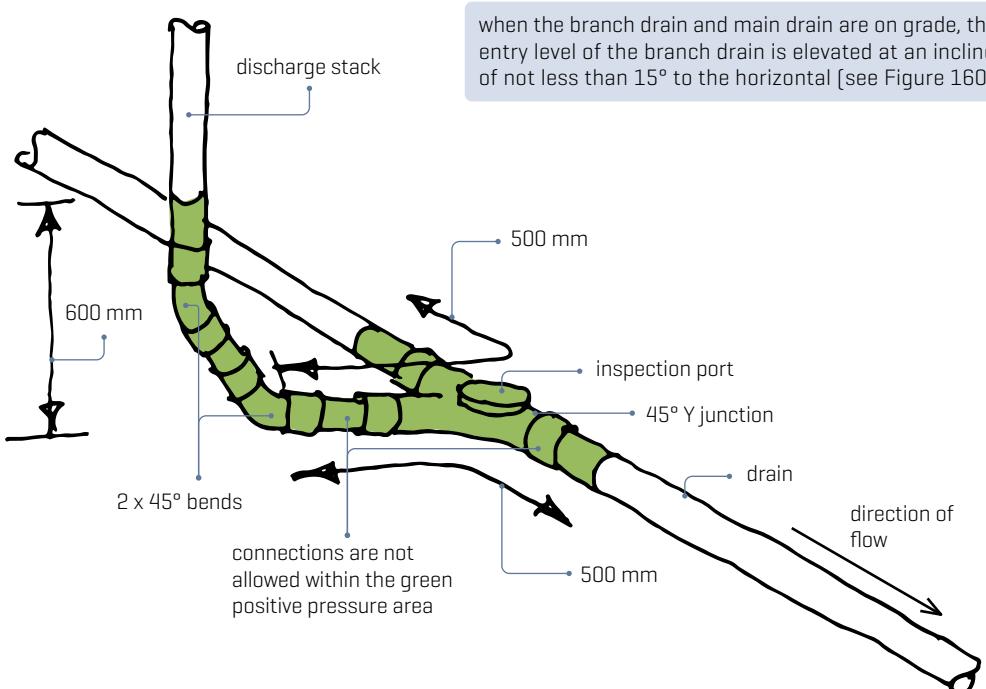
Restrictions on connections at base of discharge stack serving two floors.
